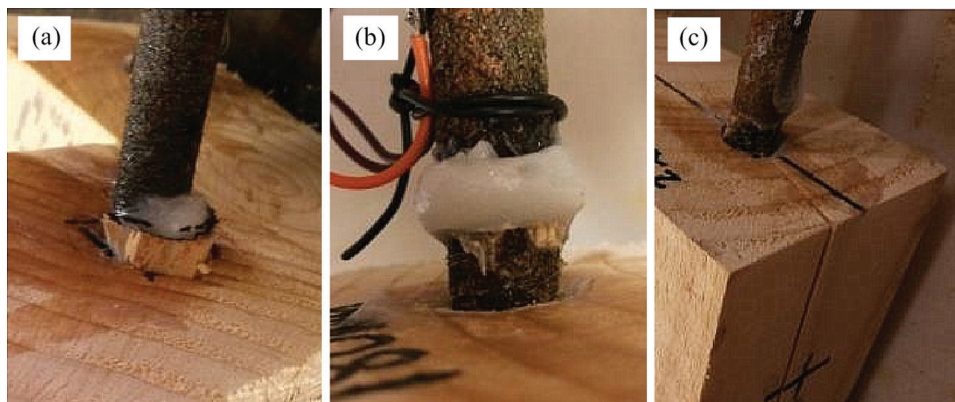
Typical failure modes of GiR specimens: (a) shear in timber; (b) bar/adhesive failure; (c) timber splitting [68]
